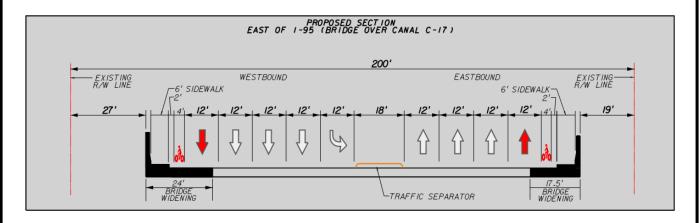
shows the proposed typical sections for Alternative 1. From Northpoint Boulevard to the I-95 southbound ramp terminals 45th Street would provide four 12-ft through lanes, two 11-ft left turn lanes and one 12-ft right turn lane in each direction with a 6.5-ft traffic separator. From the southbound ramp terminal to the northbound ramp terminals this section would provide four 11-ft through lanes and two 10-ft left turn lanes in each direction with a 12-ft barrier. From the northbound ramp terminals to Congress Avenue 45th Street would provide four 12-ft through lanes and one 12-ft left-turn lane, with triple left-turn lanes at Congress Avenue. This section would also include continuous 4-ft bicycle lanes and 6-ft sidewalks on each side of the roadway.
